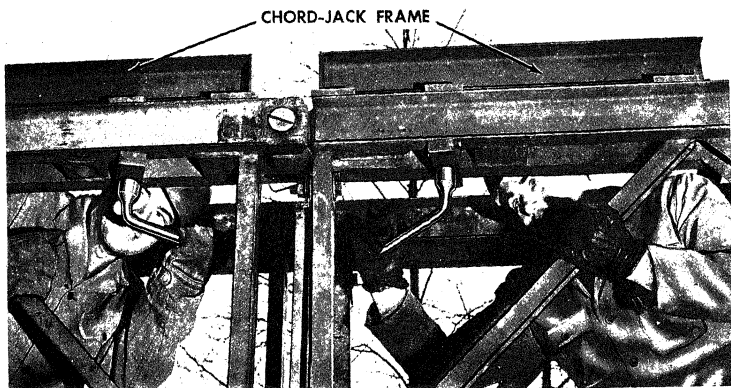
Installing chord-jack frames on top-story inside truss of double-double bridges.
